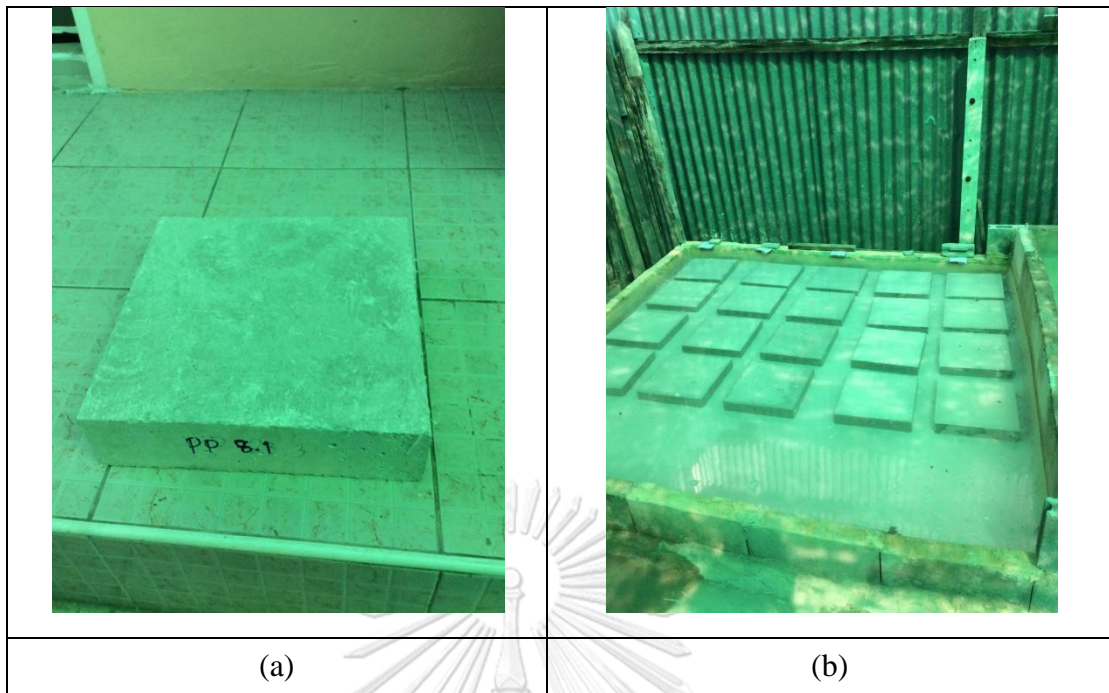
Photographs of cube concrete (a) Cube concrete ( $30 \times 30 \times 7.5 \text{ cm}^3$ ) and (b) Cube concrete in lime-saturated water pond 28 days
